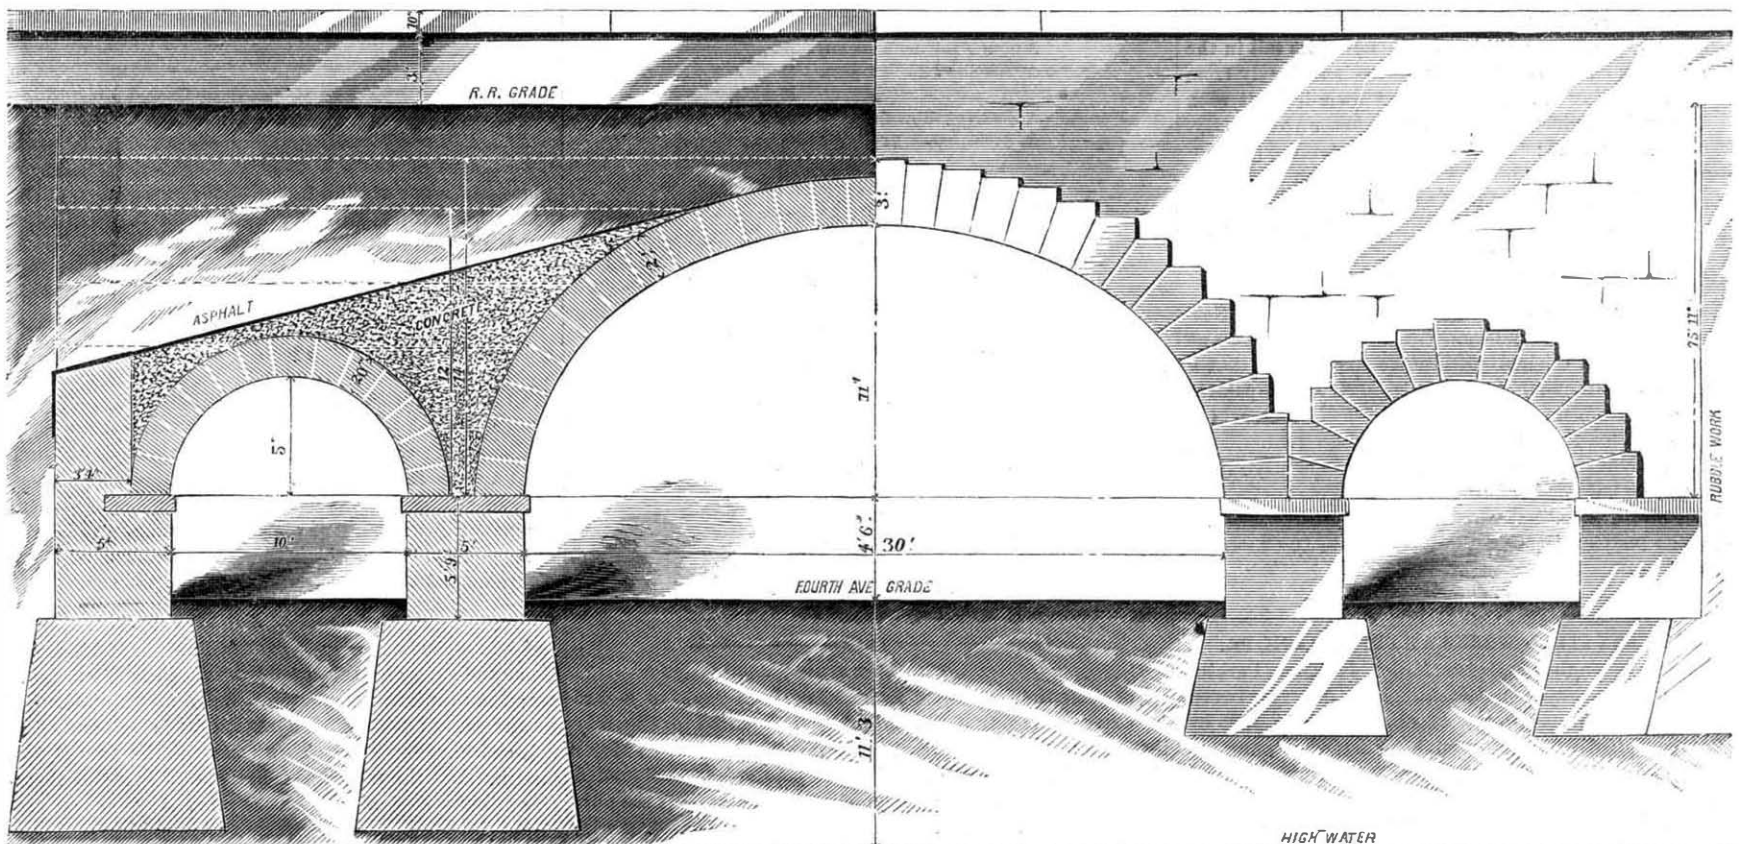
THE UNDERGROUND RAILWAY, NEW YORK CITY.—SIDE ELEVATION OF VIADUCT AT STREET CROSSINGS.
